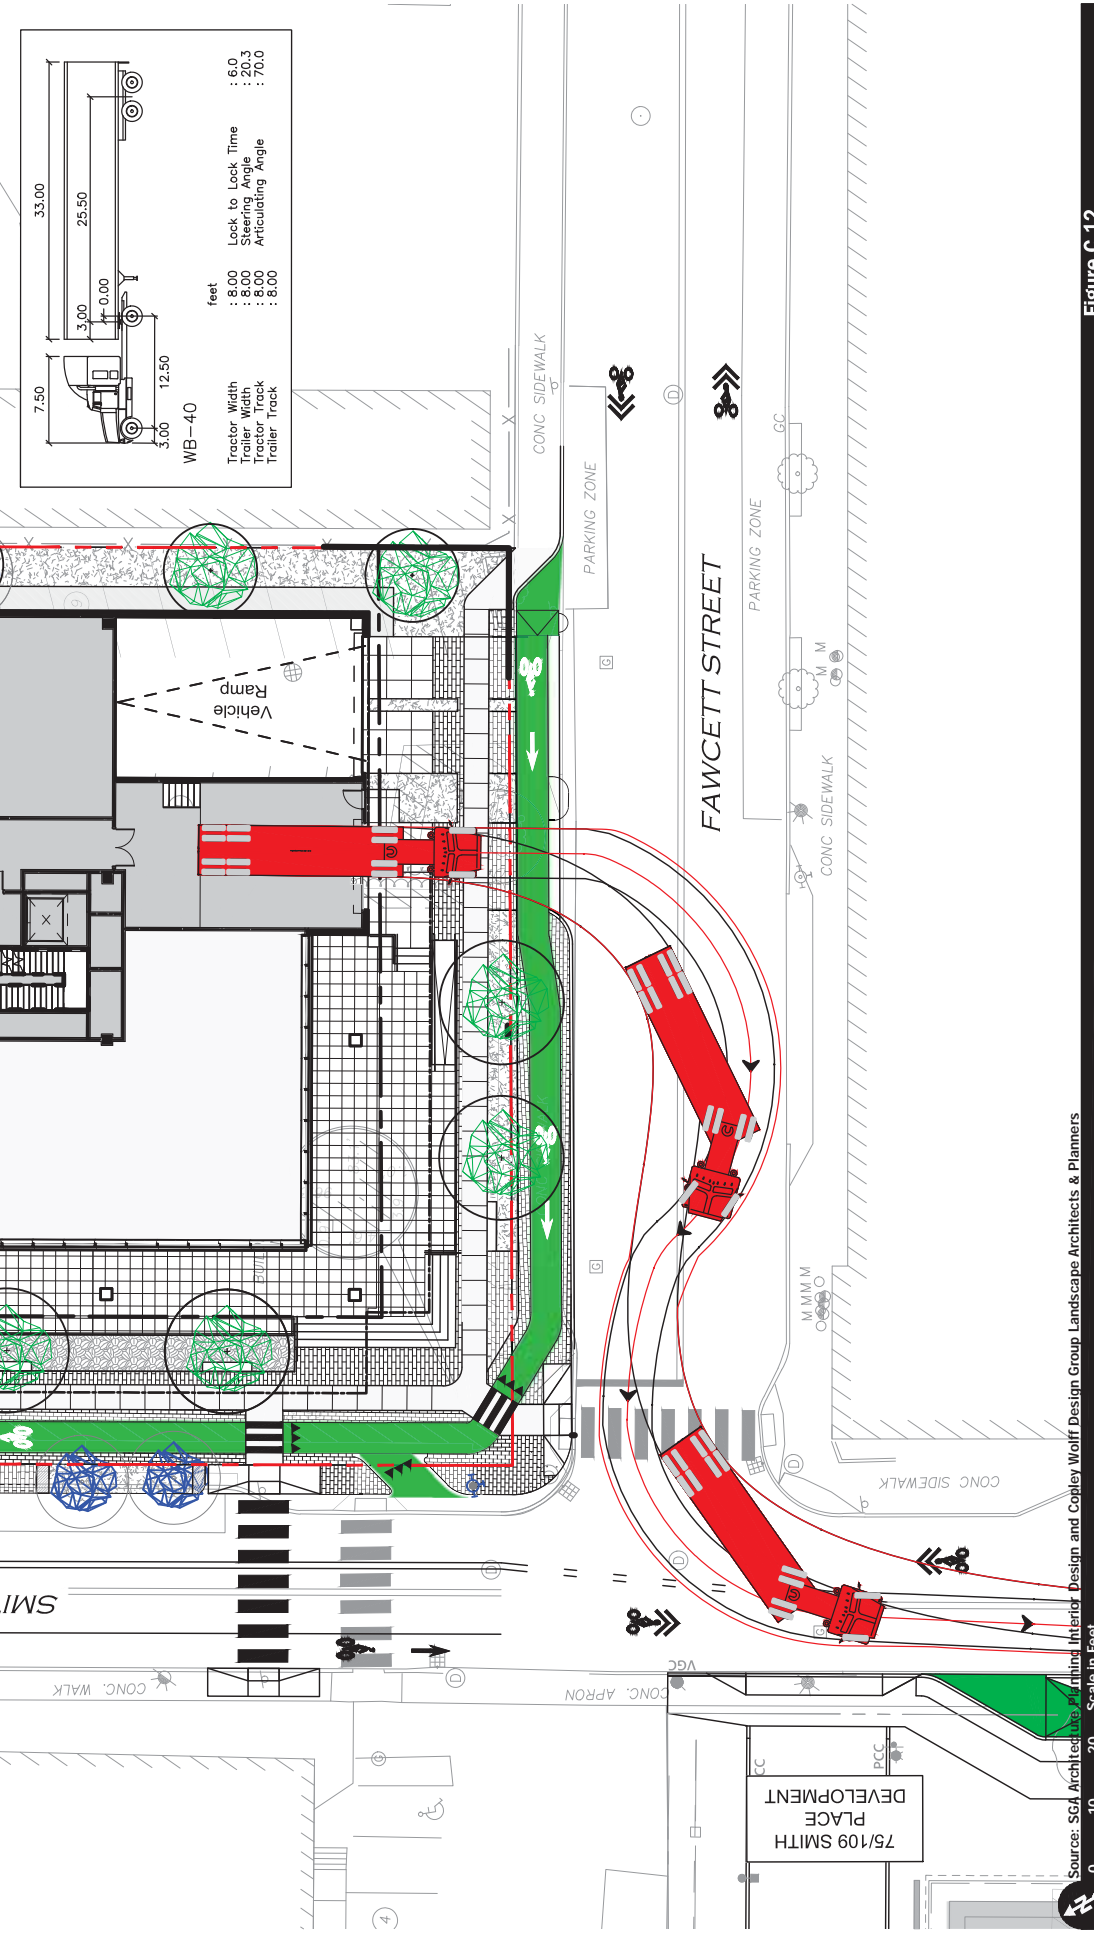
Proposed Site - Day One Autoturn Diagram WB-40 Truck Exiting Loading Area
